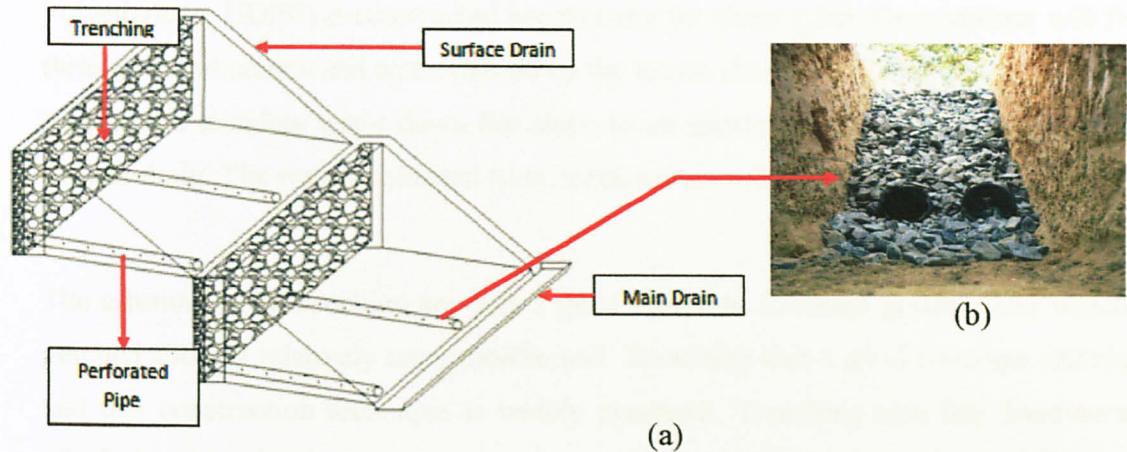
(a) Proposed Design of Trenching at Actual Slope; (b) Example of cross section of the trenching
